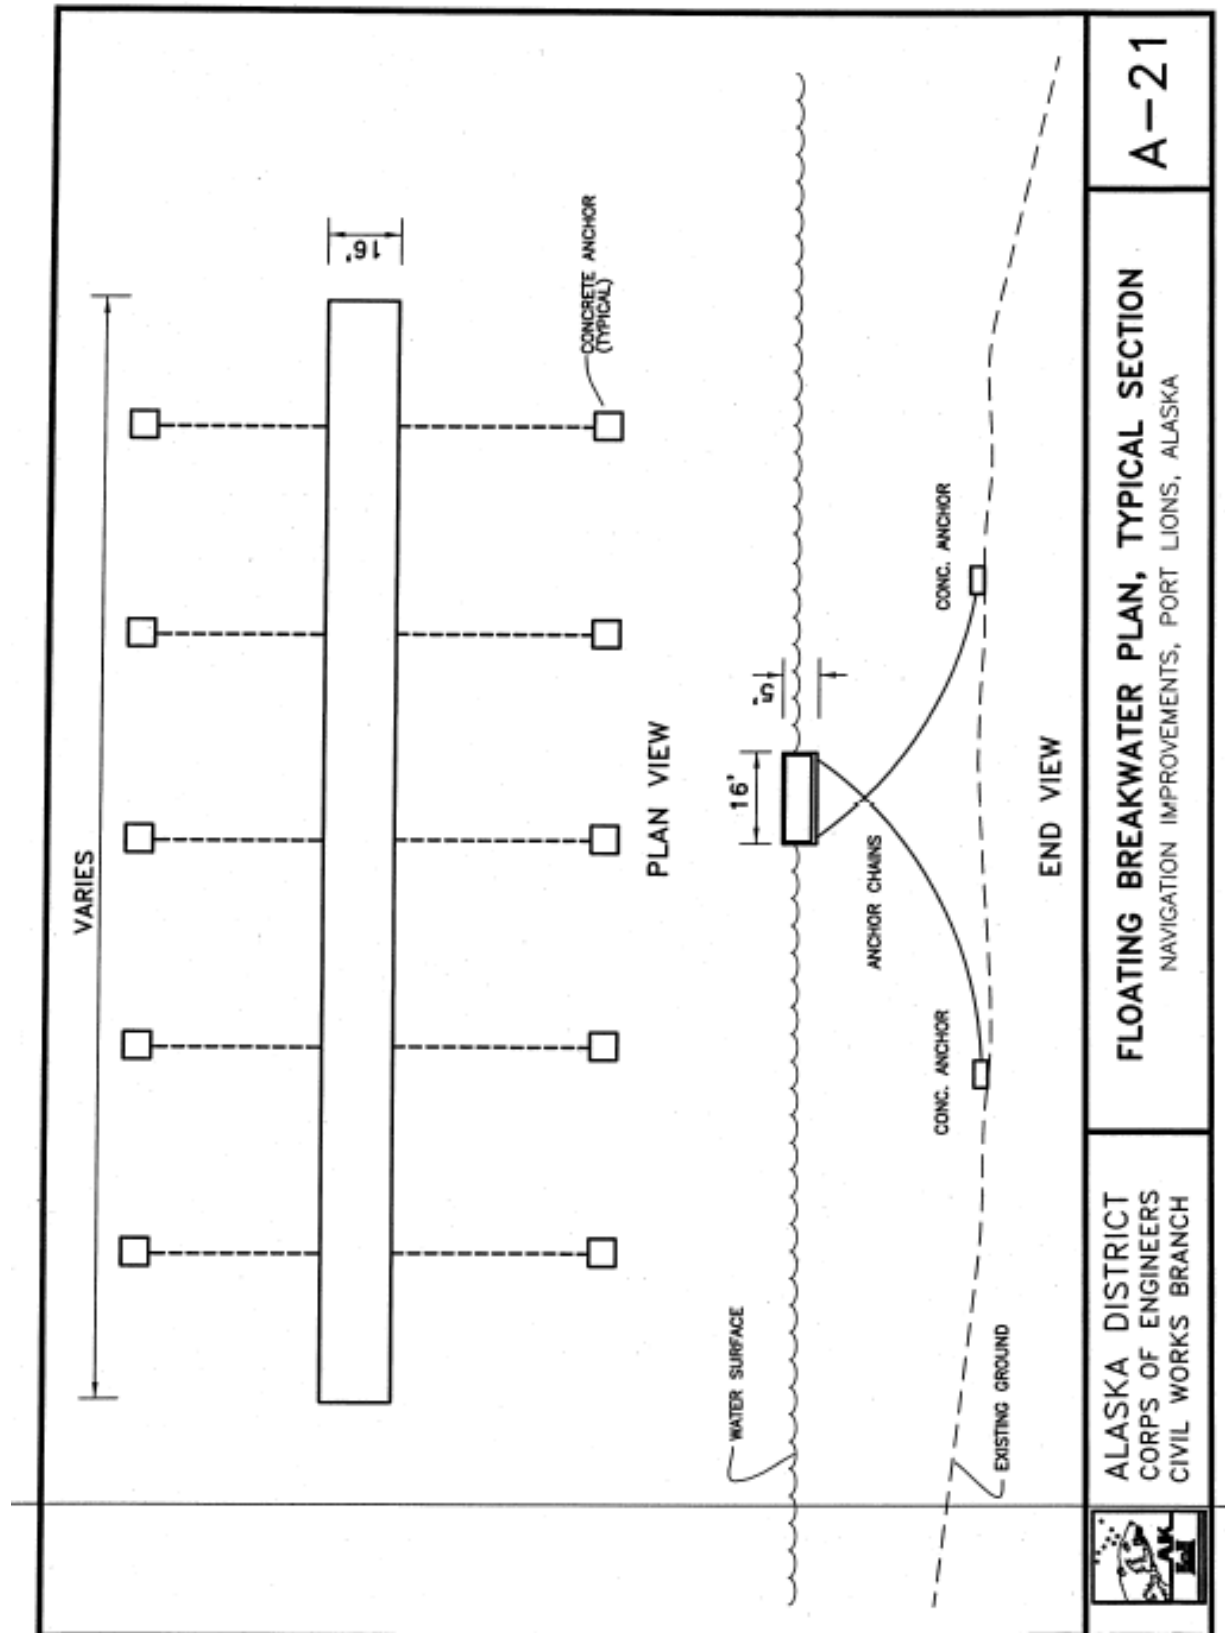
Floating Breakwater Plan, Typical Cross-Section
